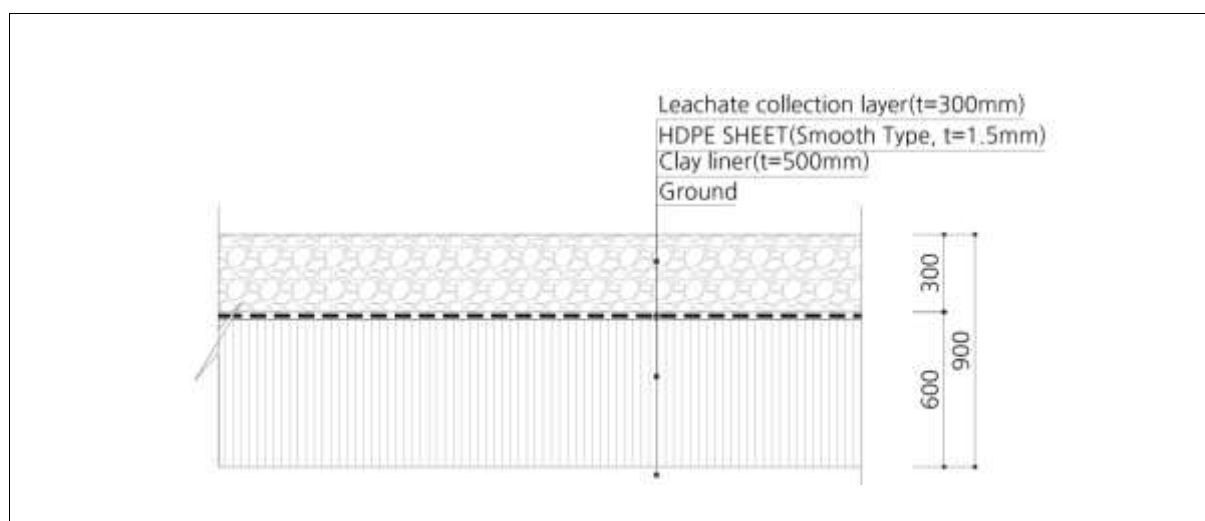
Sectional drawing of Leachate liner system in U.S.A
